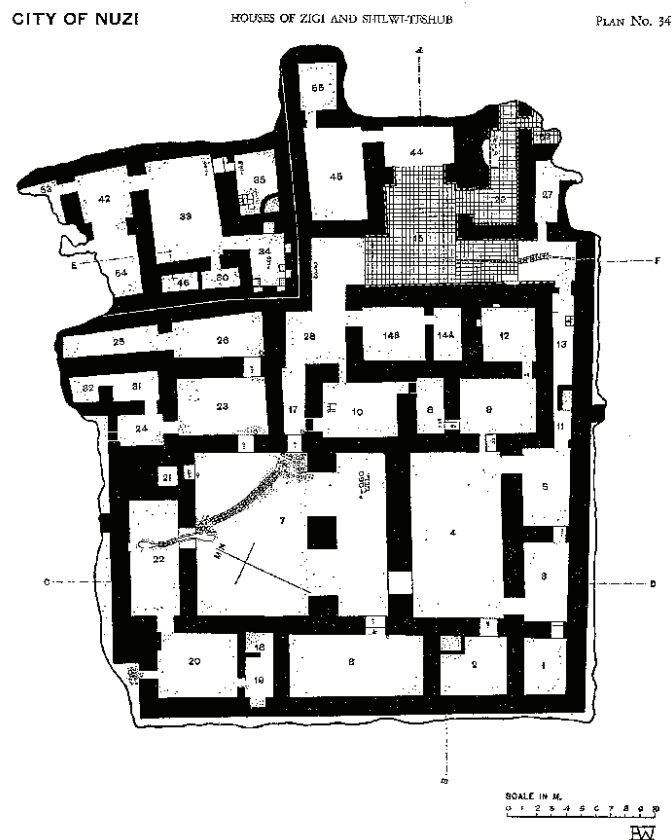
Plan of the suburban houses of Zigi and Shilwi-Teshub (Starr, 1937: Plan 36)
